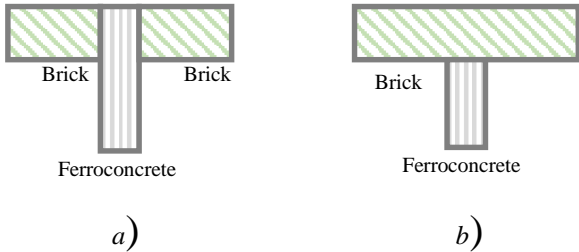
a) Wedging a reinforced concrete wall into a brick wall; b) Desirable perpendicular joining of a brick and reinforced concrete wall
